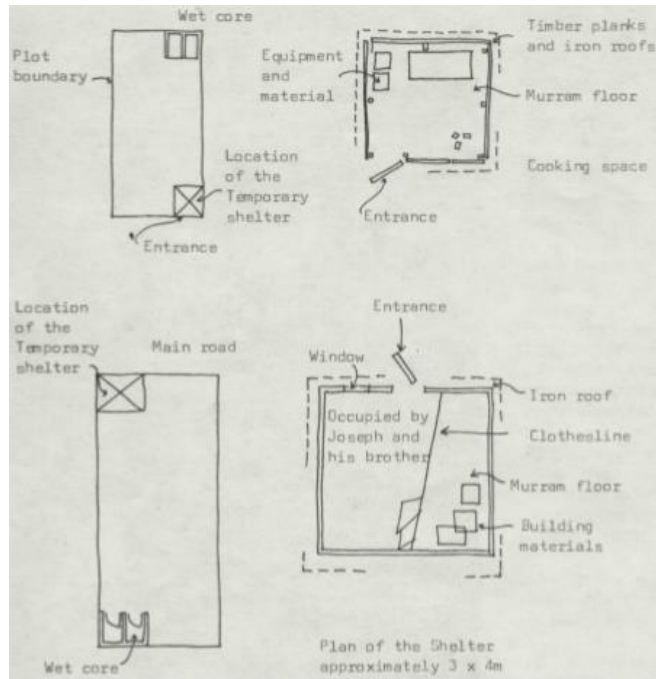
Typical layouts of temporary shelters (Source: Praful Soni field notes, 1981)
